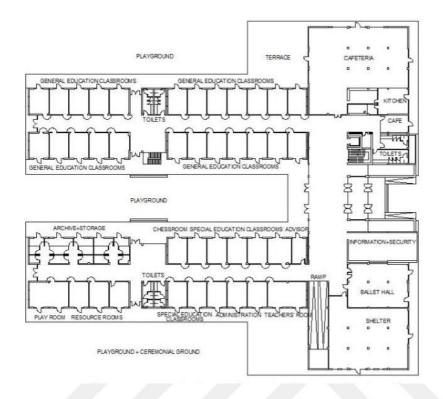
Gökkuşağı Primary School ground floor plan (Durak, 2010).
